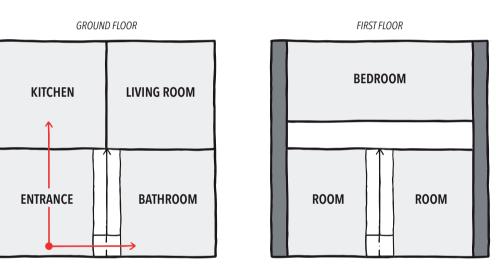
The straight staircase causing the semi-heated space to be used as internal flow area
